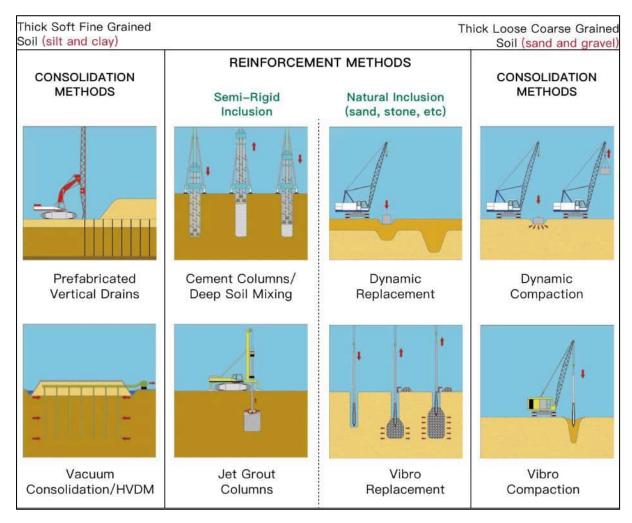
Common Ground Improvement Techniques Prior to Excavation [W-15]
